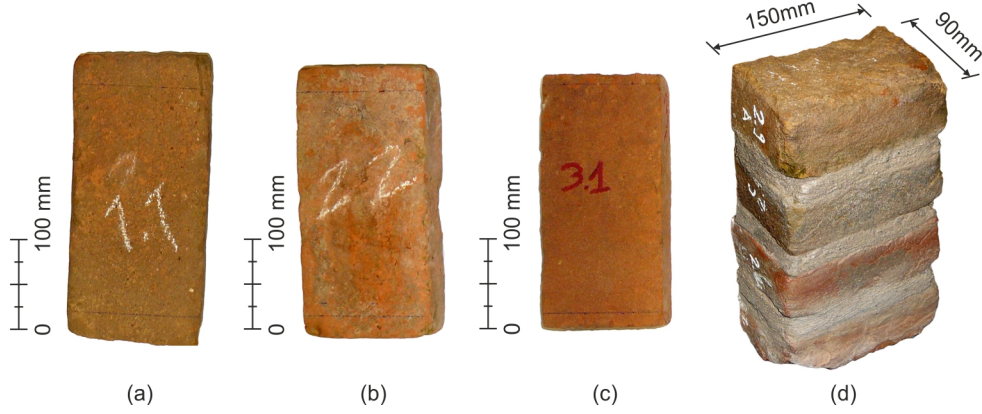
Types of brick employed: (a) A type; (b) B type; (c) C type and (d) masonry block before the reinforcement application.
